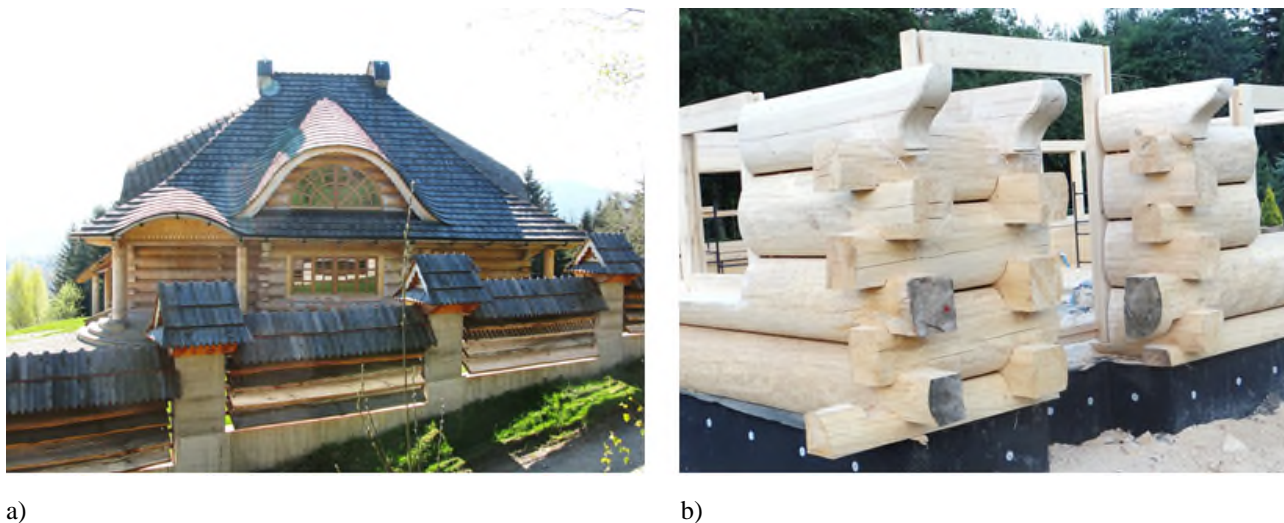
Examples of historical building techniques: a) contemporary single-family building constructed using a corner-notched log technology; b) assembly of a single-family corner-notched log building in 2015.
